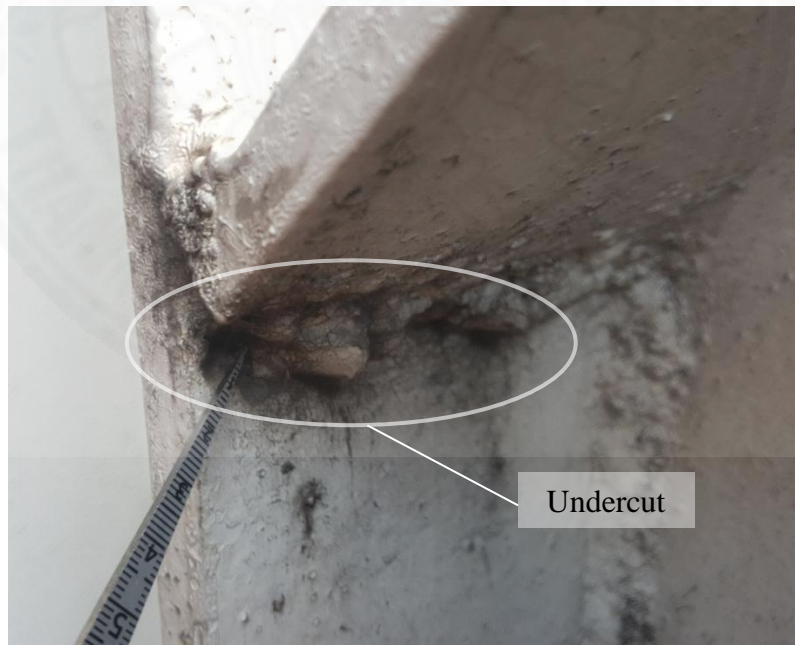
Welding defects on Steel Structure B (joint 4)
